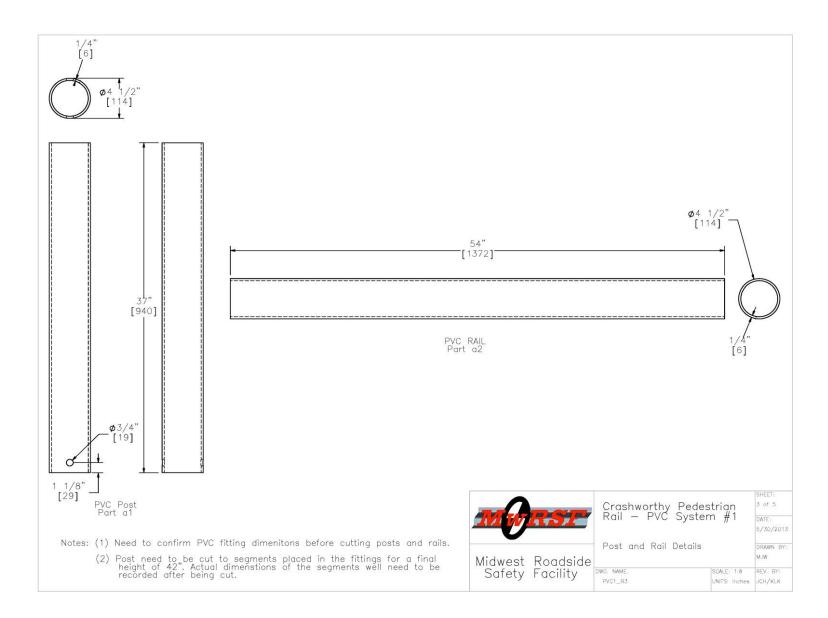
Modular PVC Rail, Design Concept PVC1 (Sheet 3 of 5)
